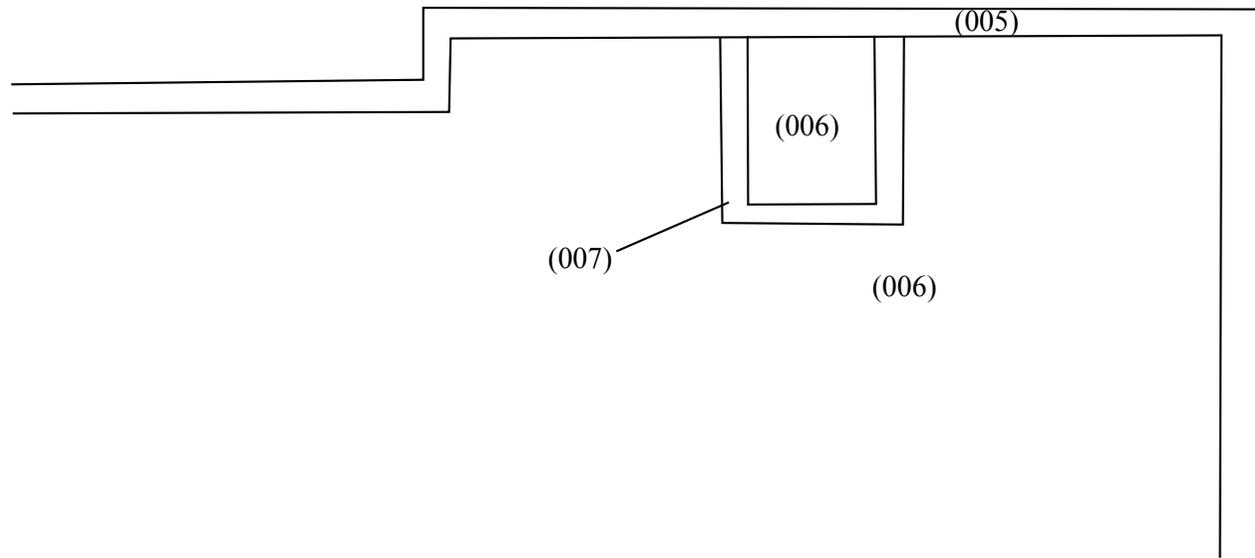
Detail of Steel Truss of Roof of Western Building set in Bricks Above Concrete Lintel
